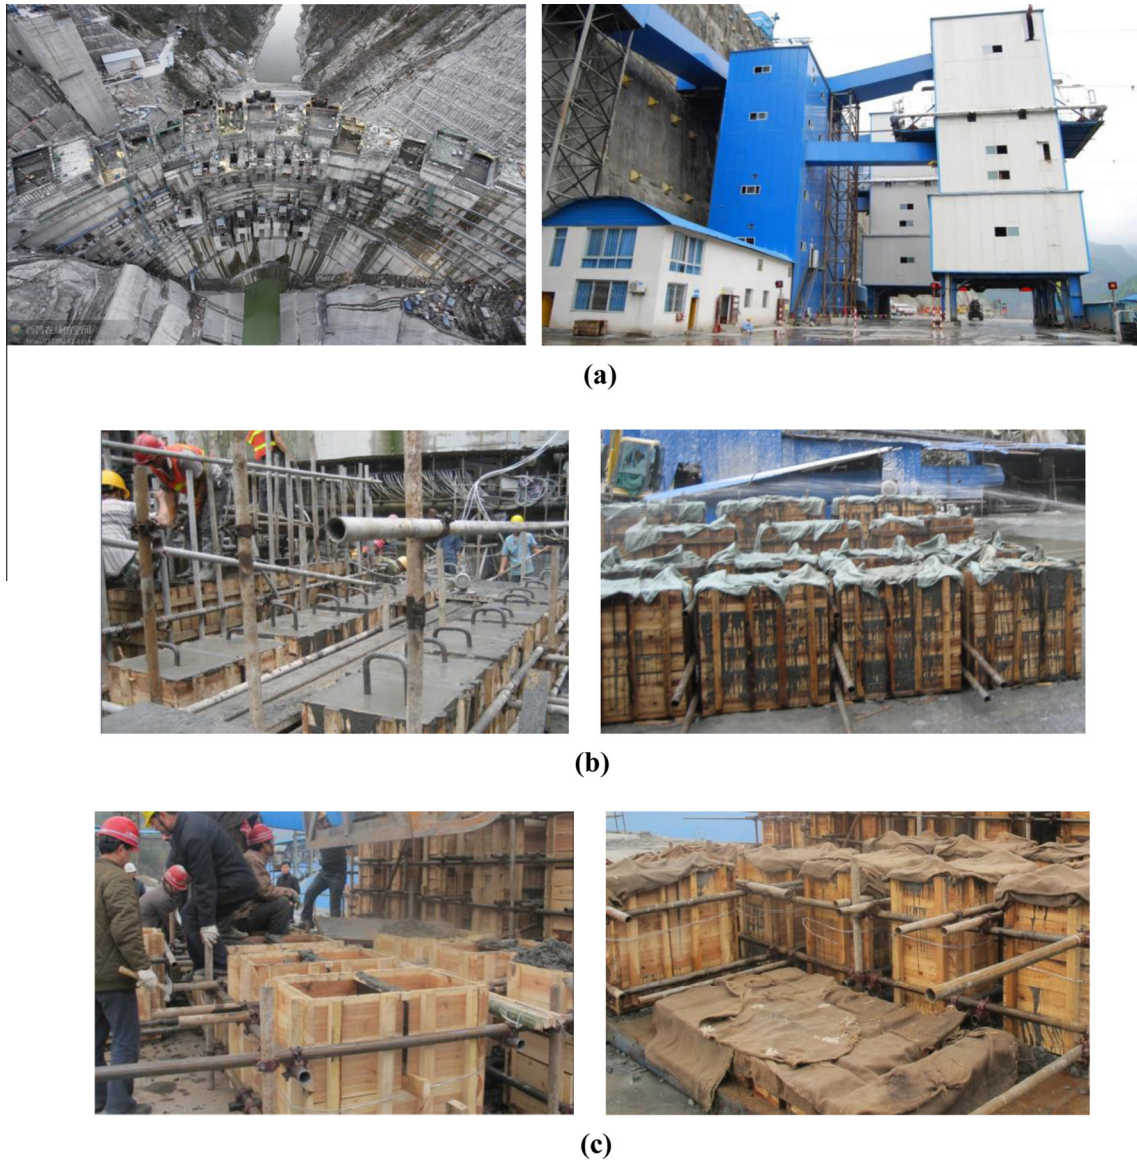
Actual specimen cast in a construction site of a super-high arch dam: (a) super high arch dam and concrete mixing tower; (b) casting and curing in summer [19]; (c) casting and curing in winter.
